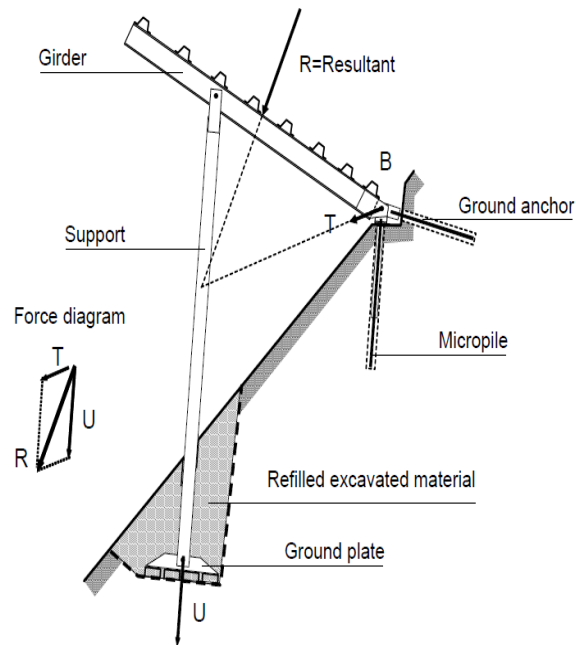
Components of a steel snow bridge (Margreth, 2007)
